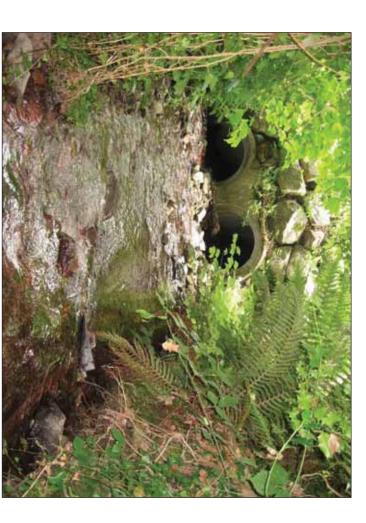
Bleach Hill Stream, entering culvert under road, looking southwest
